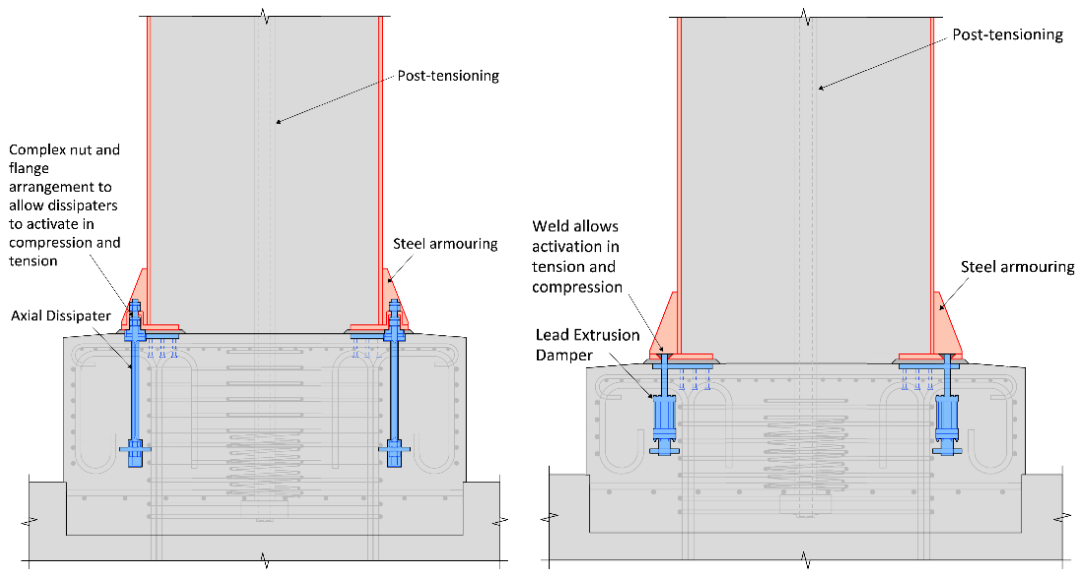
Left – as designed Wigram Magdala Bridge pier-foundation connection, Right – Wigram Magdala pier-foundation connections adapted
